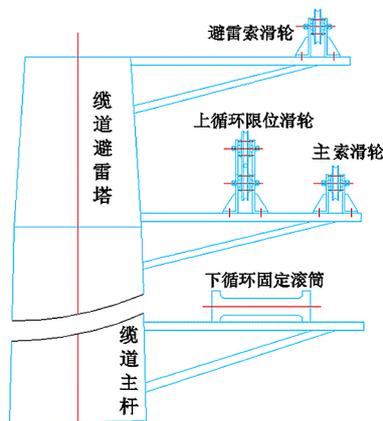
Schematic diagram of cantilever fixing frame arrangement
